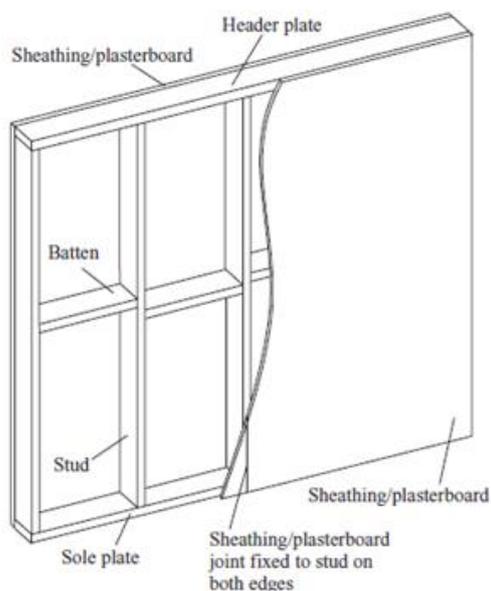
Details of a typical stud wall. (Porteous & Kermani 2007)
